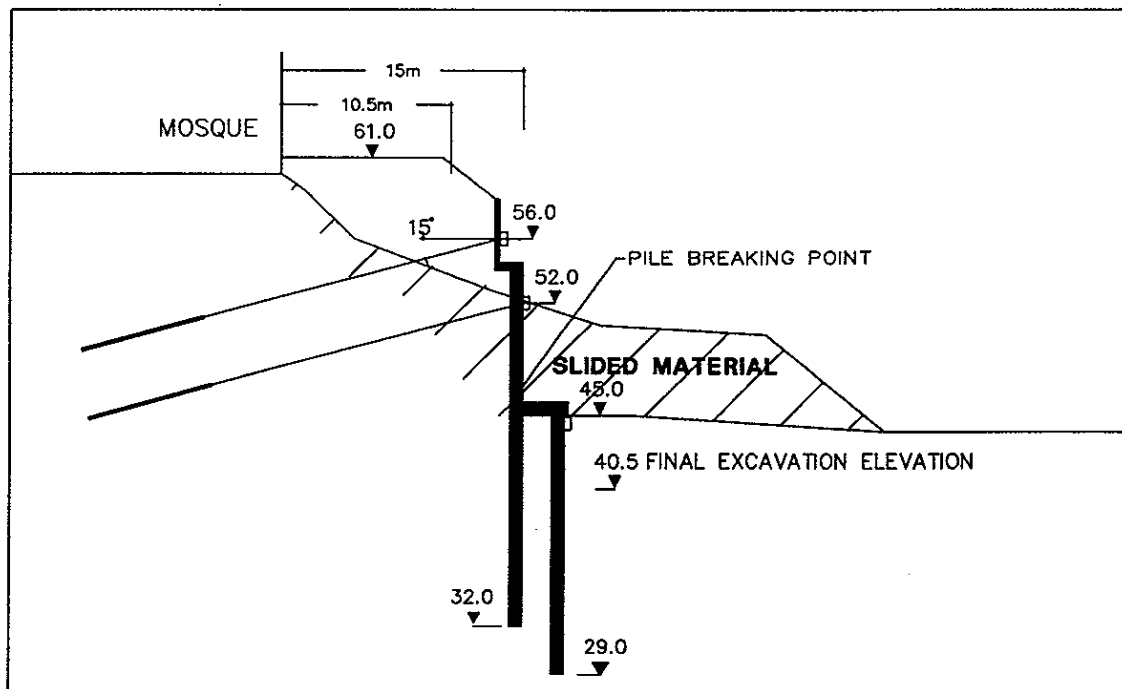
Typical Cross Section of Tieback Retaining Wall and Failure Geometry
